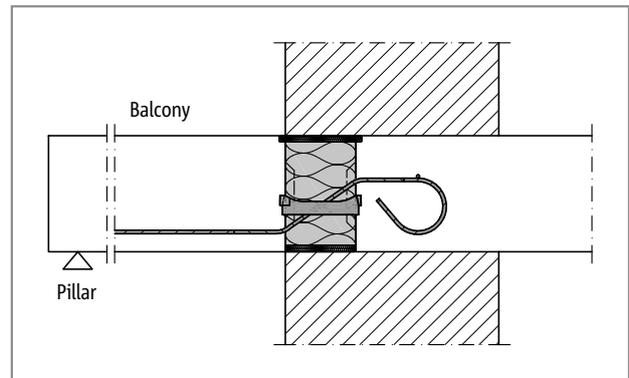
Schöck Isokorb® XT type Q: Connection with single wall, thermally insulating masonry (XT type Q-V1 to V4)
